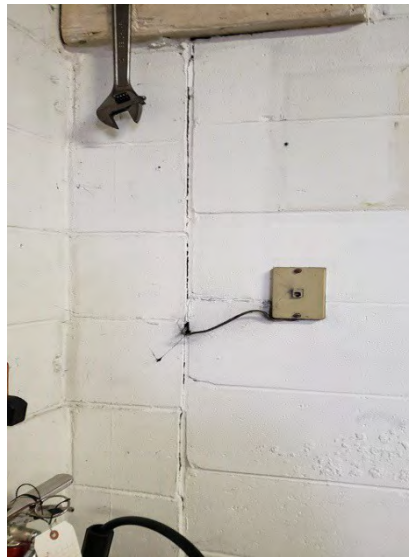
Mortar Joint Cracking in Compressor Room
